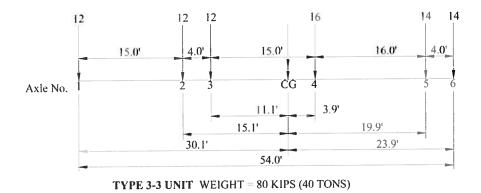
B.7.2-1—Typical Legal Loads Used for Posting
